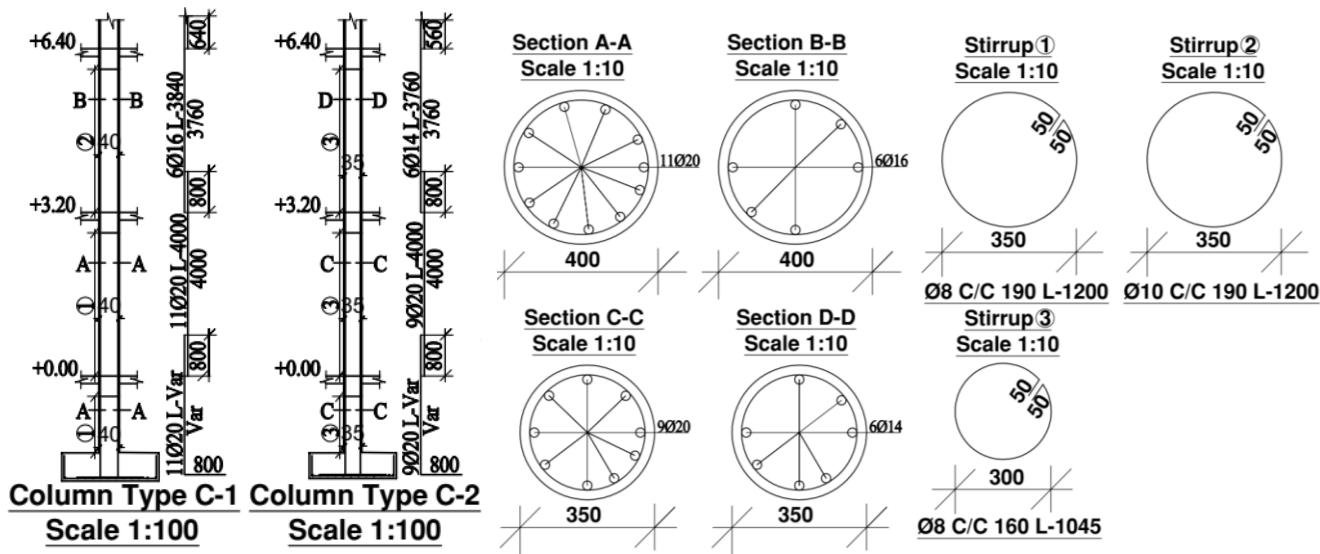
Sample column detailing for G+2 building with C-25 concrete
